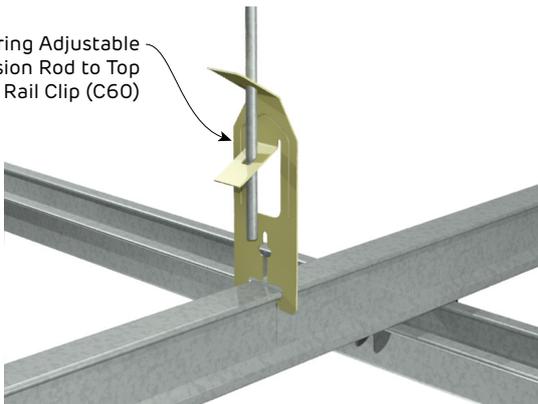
Spring Adjustable Suspension Rod to TCR Clip
